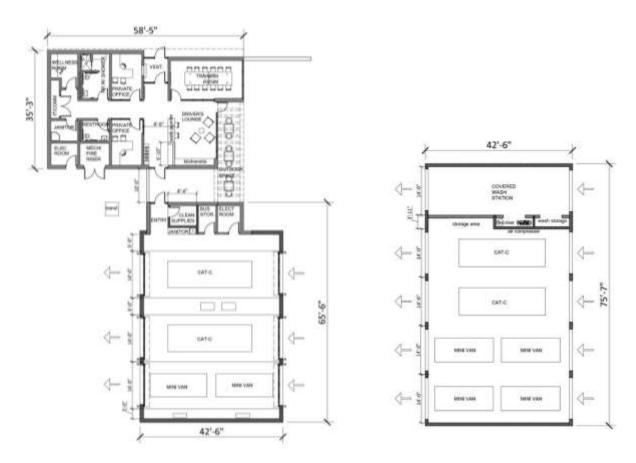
Alternative 2 Bus Barn, Bus Shelter and Administration Building Plans
